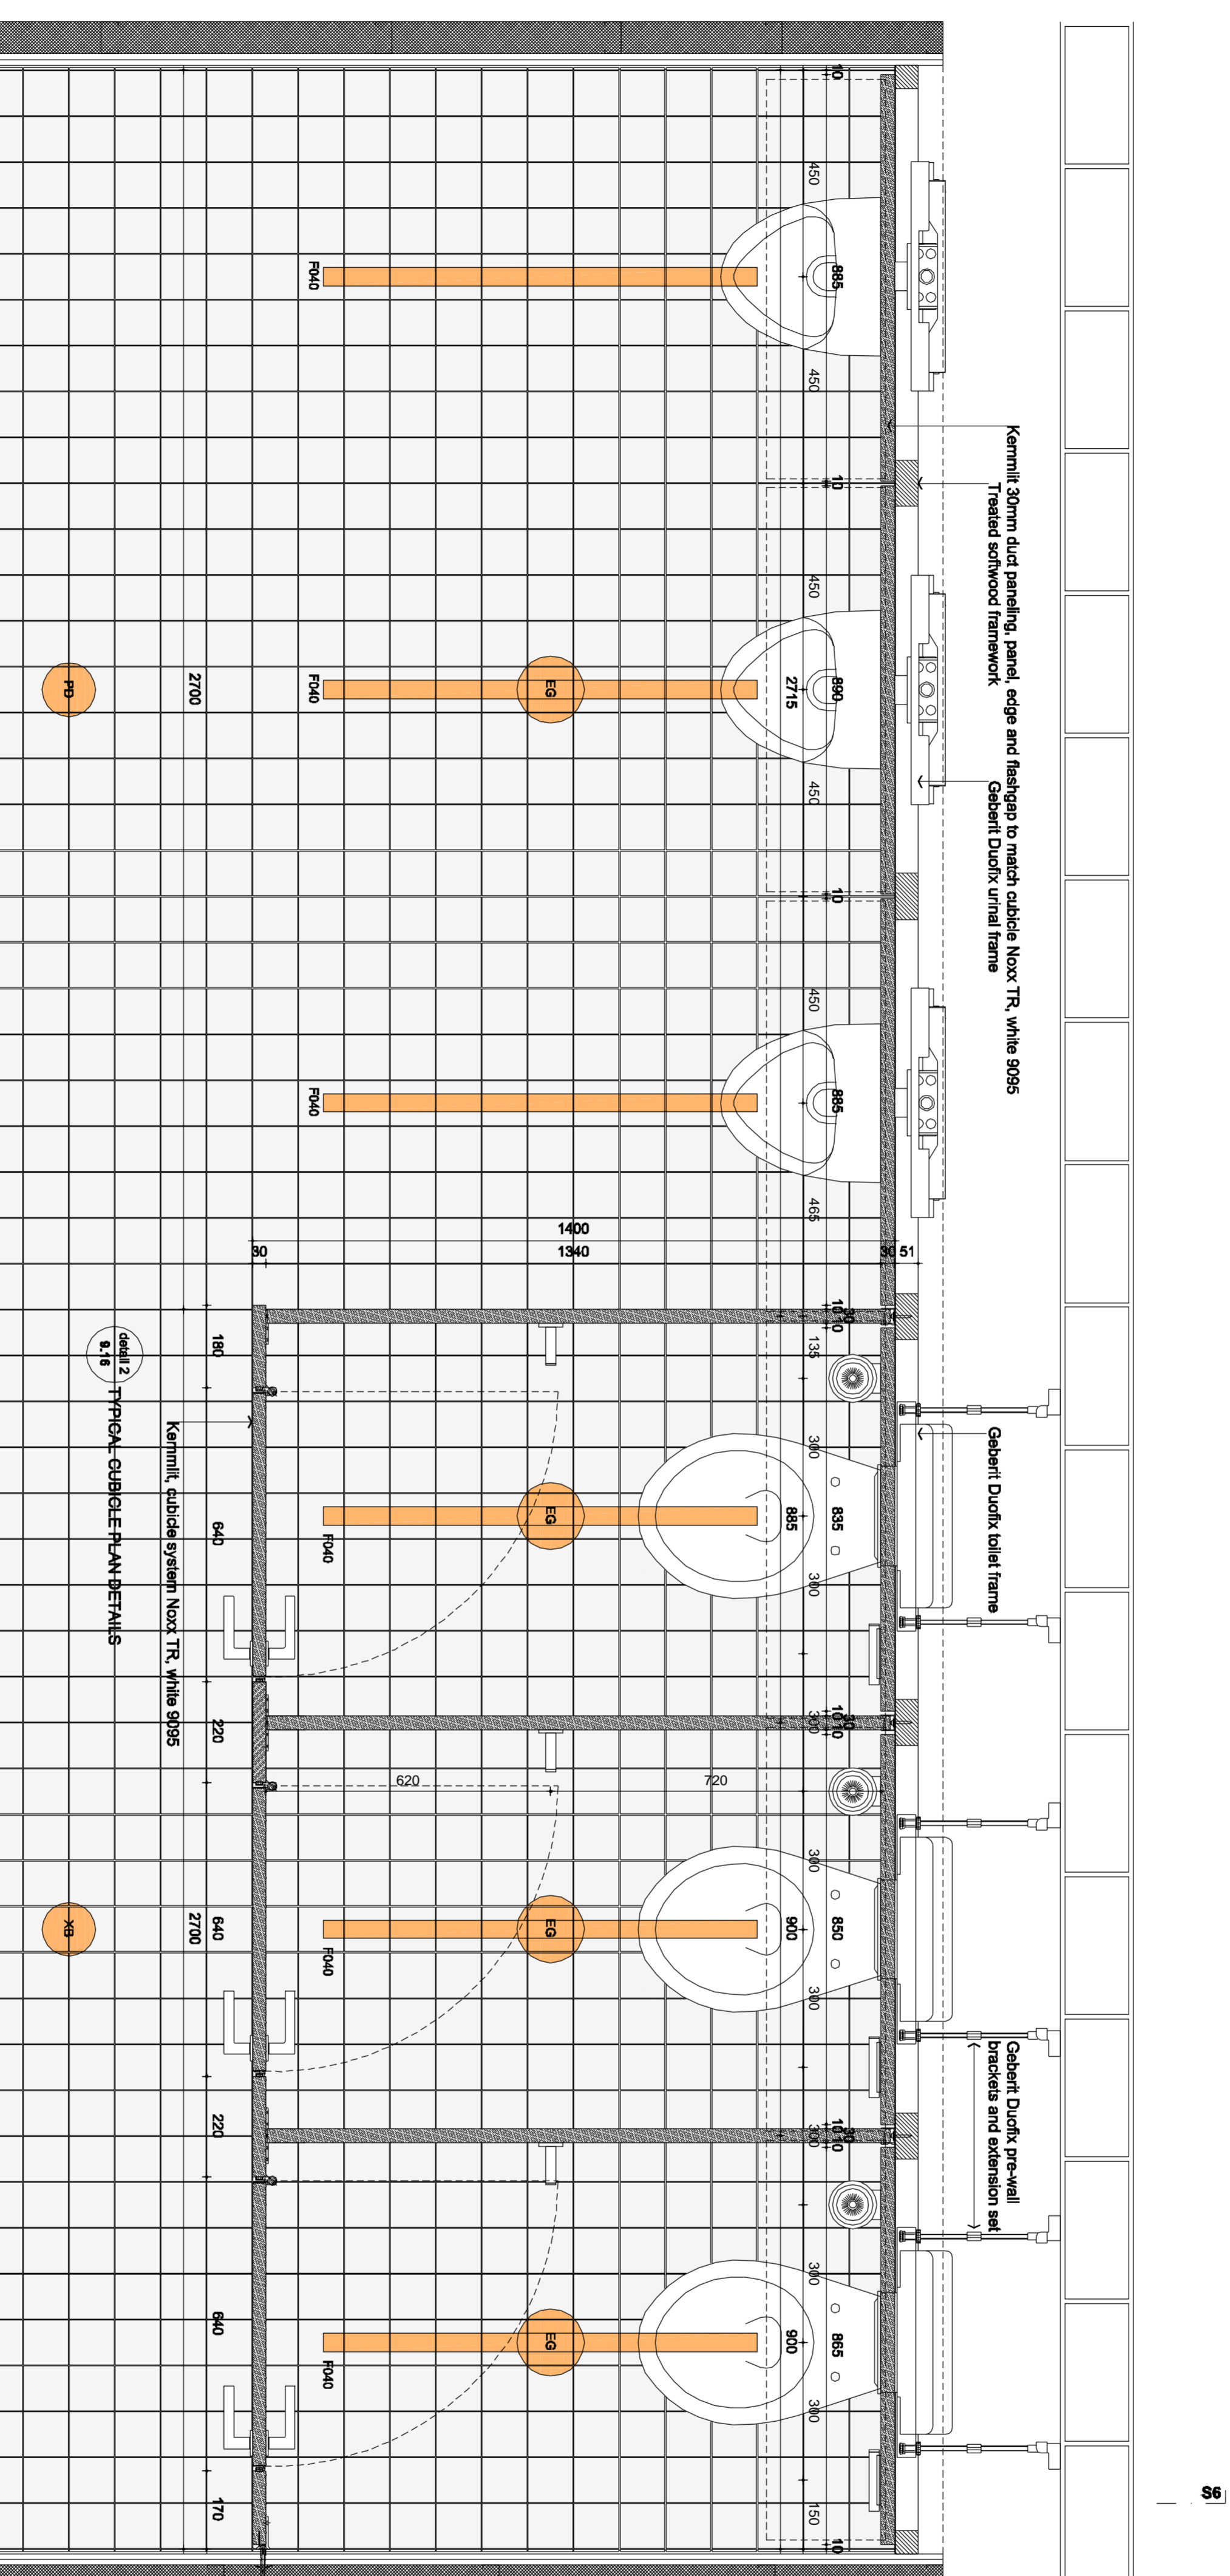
CUBICLE & DUCT PANELING TYPICAL DETAILS
